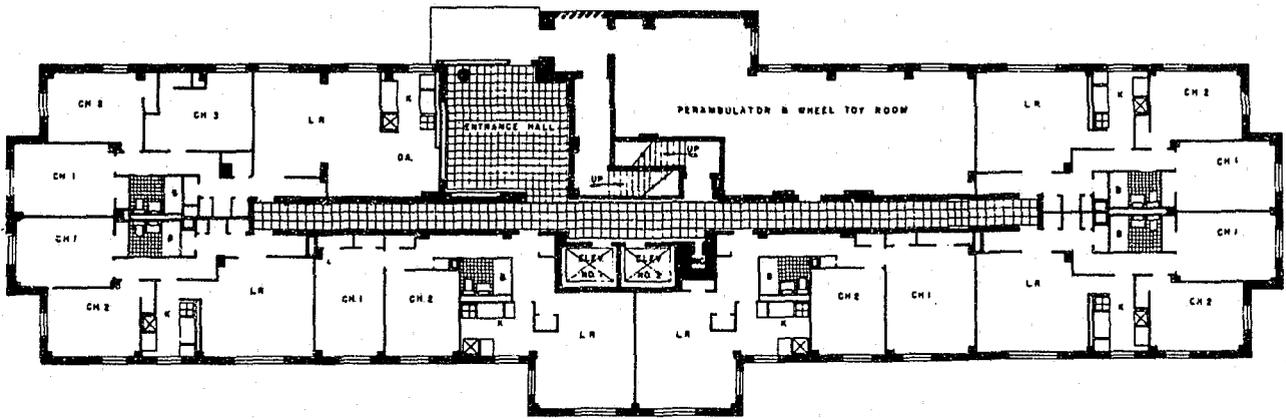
Edenwald Houses, Bronx, N.Y. Ground floor plan. Shows how separate exits from scissor stairs of high-rise building lead to the lobby or directly to the outside of the building adjacent to the entrance.
